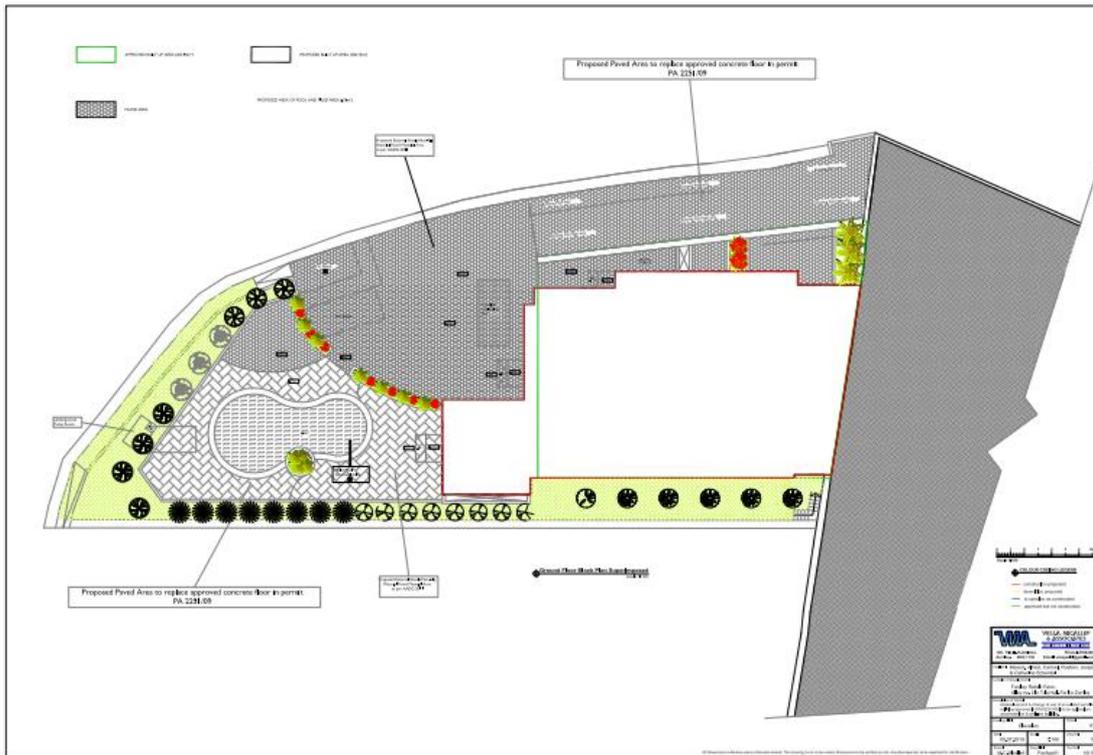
Proposed Ground Floor Plan (Source: PA 5783/19/7no)
